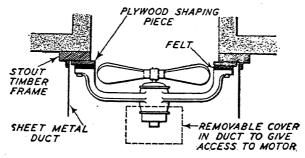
A SUITABLE METHOD OF FIXING EXTRACT PROPELLER FANS
